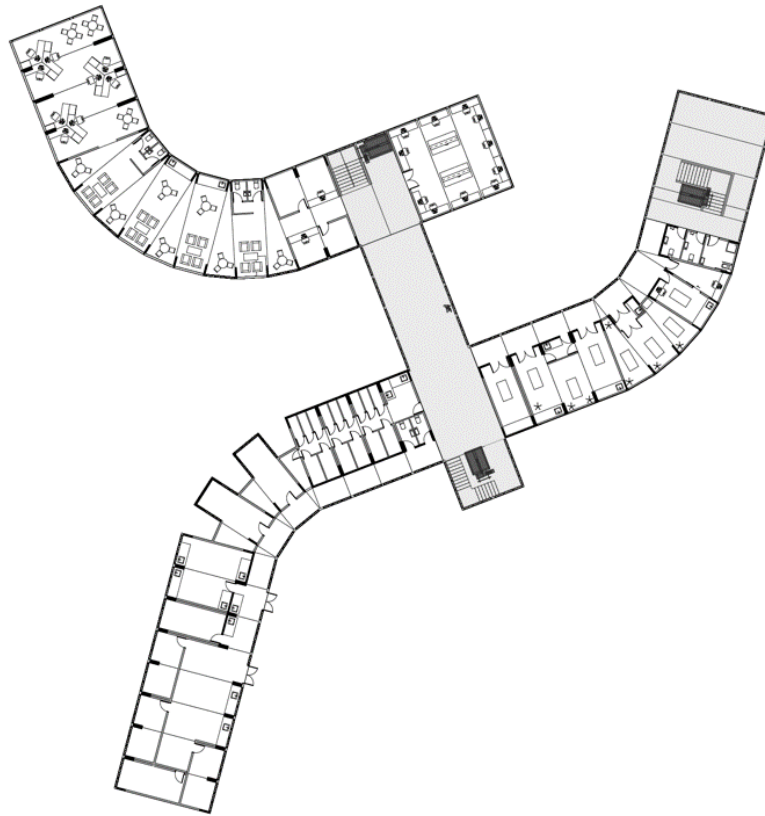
Representative floorplan of both buildings. Office building above and Koala clinic below.
